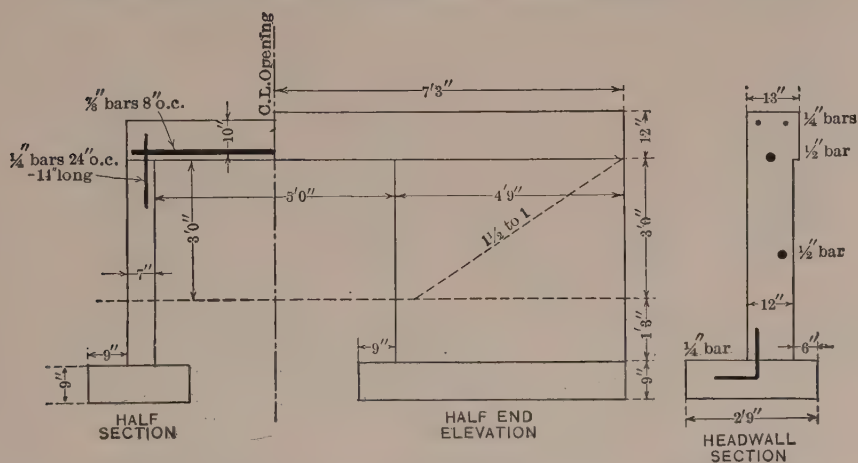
Reinforced Concrete Culvert. Massachusetts Highway Commission.
